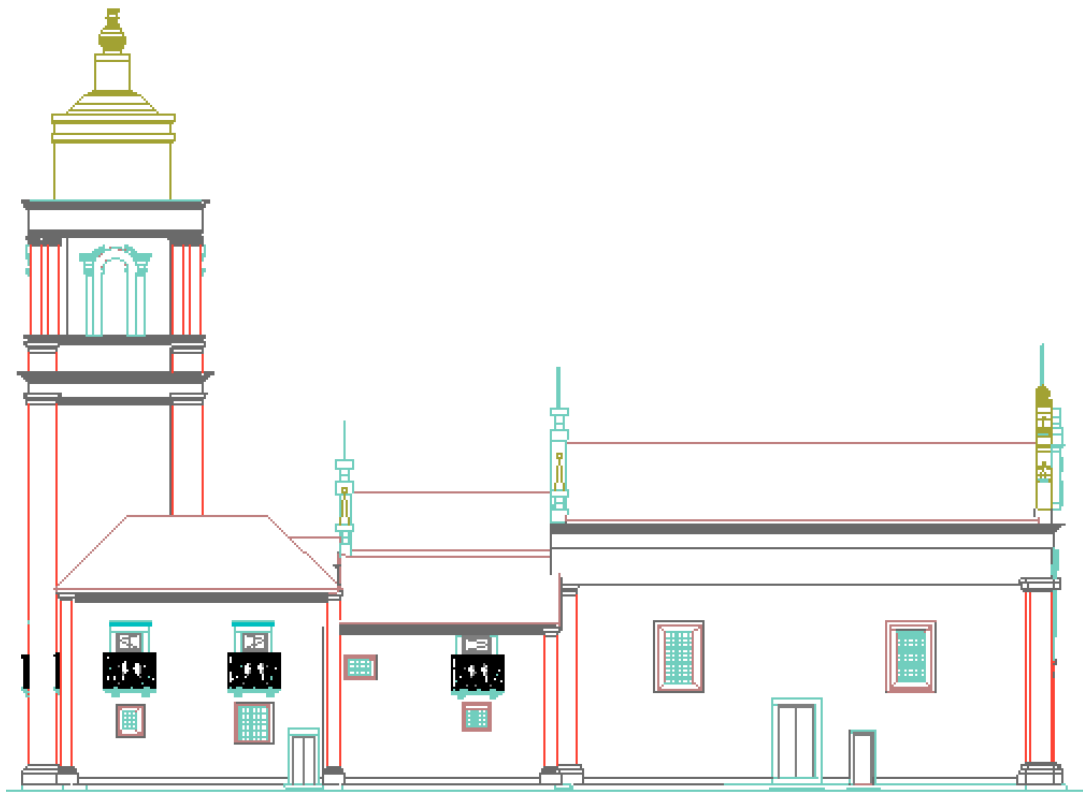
Elevation of the north façade derived from the 3D BIM model.
